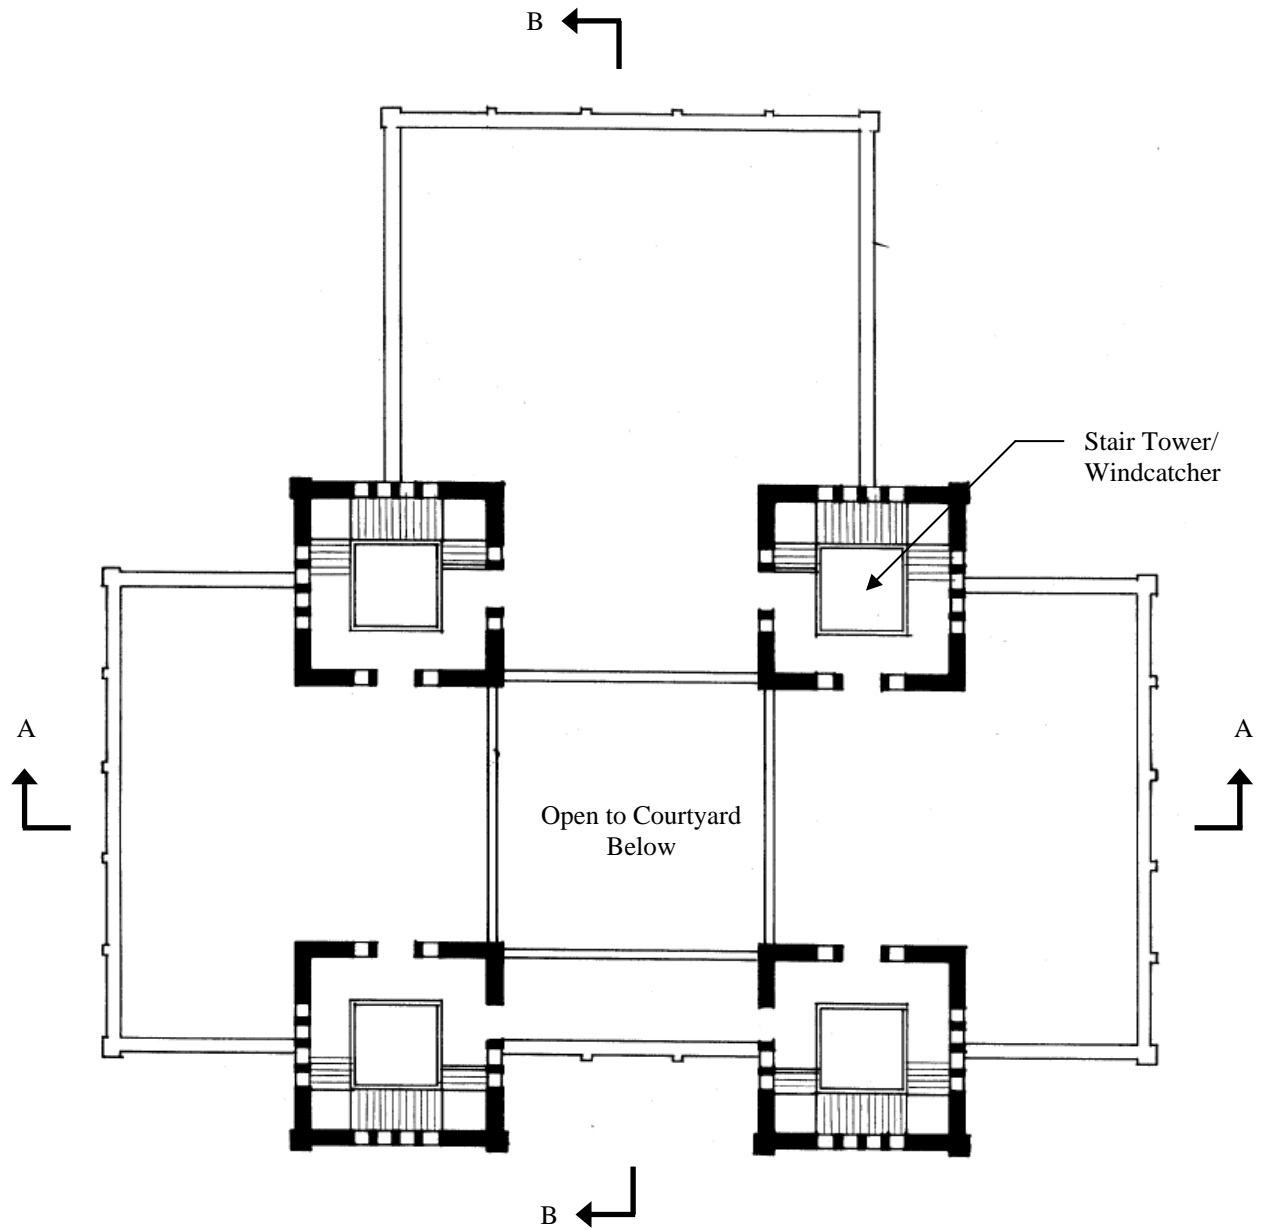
Roof Level Plan. The stair towers extend above the roof-tops of the complex wings to serve as windcatchers. The roof can also be accessed by these towers.
